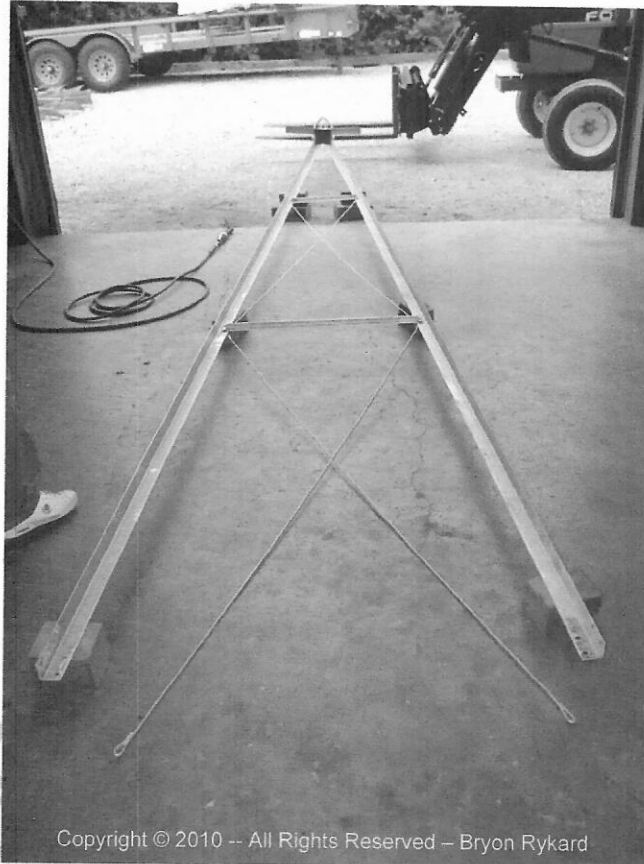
Tower with the 2 girts and 4 "X" braces assembled
